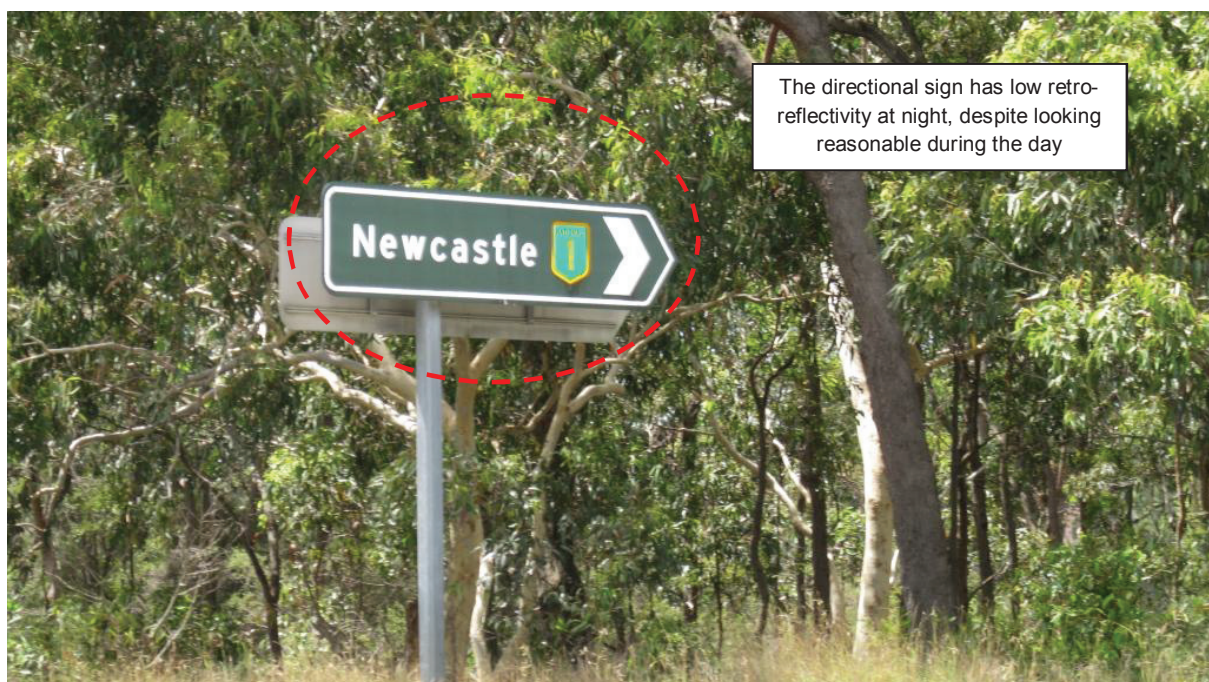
Tooheys Road, looking west toward the eastbound on-ramp of the Tooheys Road/Motorway Link Road interchange
